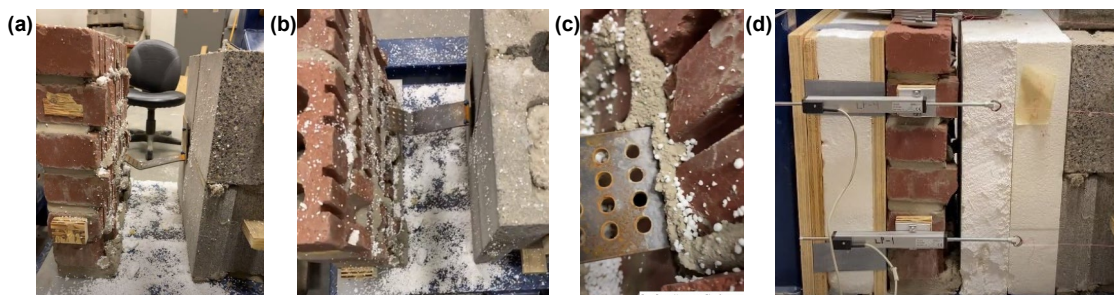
C-PH.CL-2 after testing of (a) side view, (b) top view, (c) clay brick veneer mortar joint condition, (d) specimen view during testing
